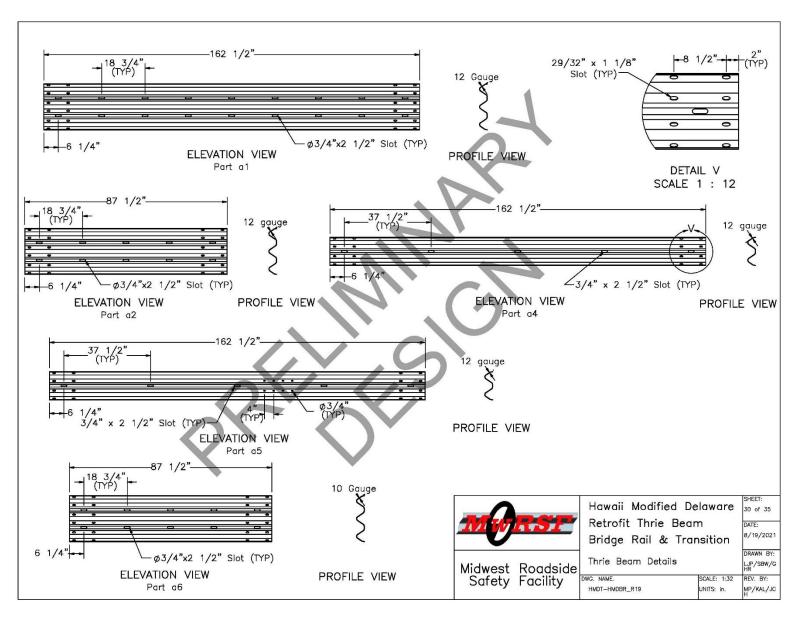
Thrie-Beam Rail Details, Test No. HMDT-1
